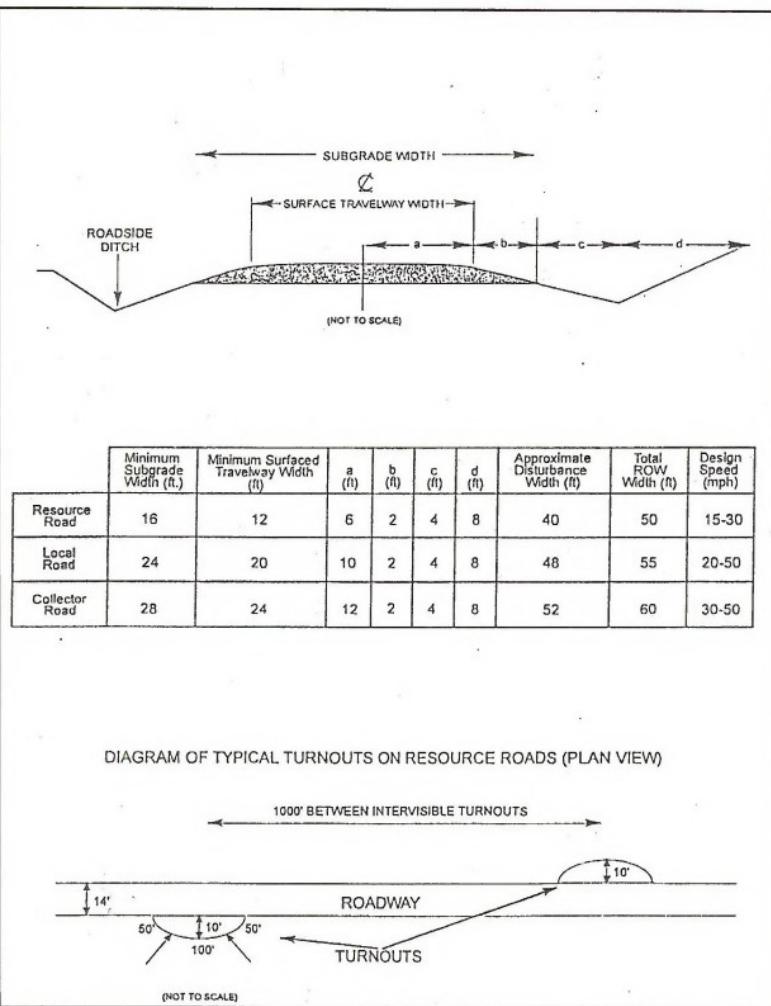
Typical Roadway Cross-Section with Width Specifications
